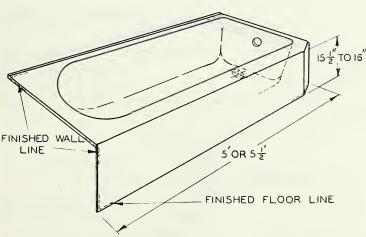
Right or left corner double-shell bathtubs with outlet on exposed end. (See par. 4.4 (b) and fig. 2.)
